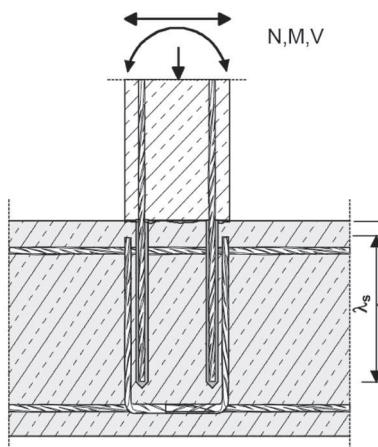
Bond superimposed to a foundation of a column or a wall where the rebars are subjected to tensile force.
